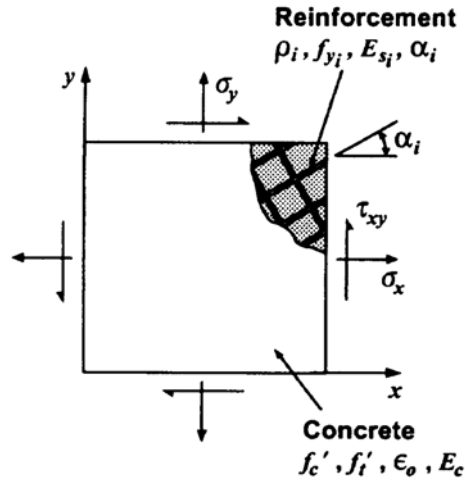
Reinforced Concrete Element – Reinforcement and Loading Conditions (Vecchio, 2000)
